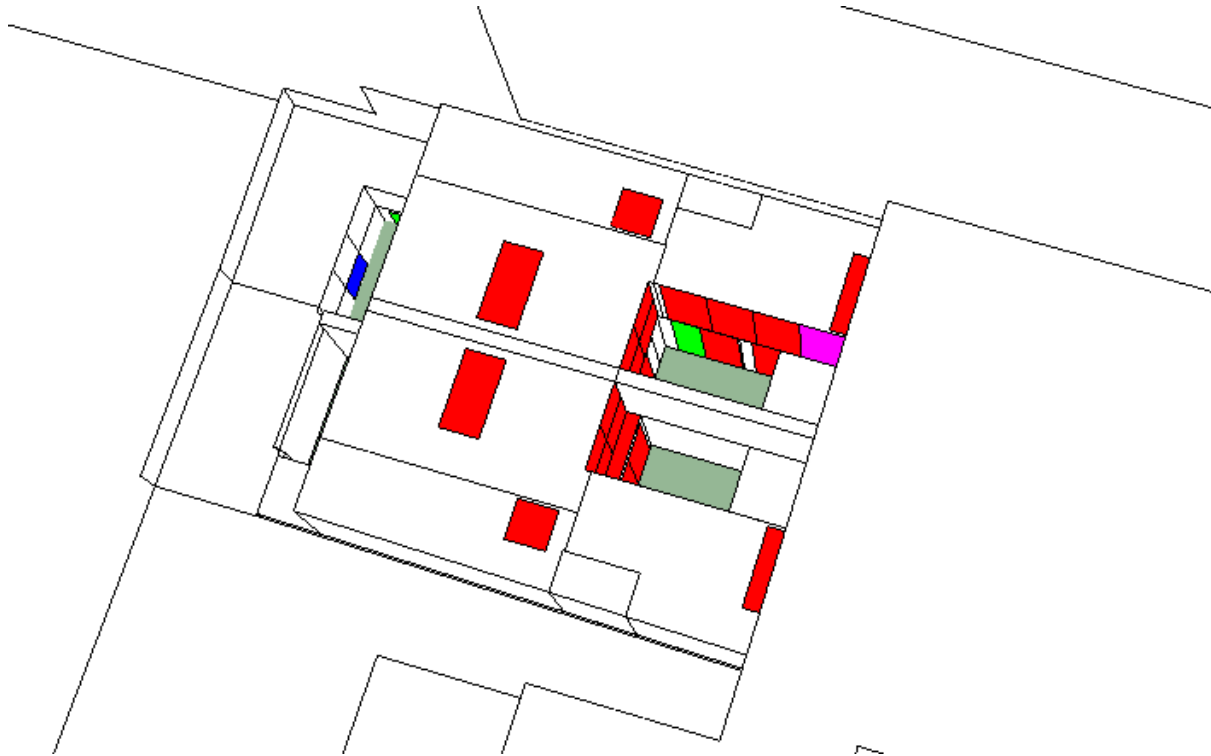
Rear Elevation Light Wells Window Openings – (North)
